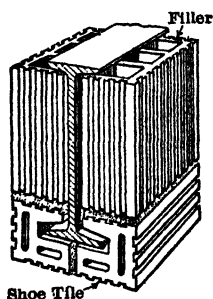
Girder Protected by Use of Shoes and One-piece Filler
